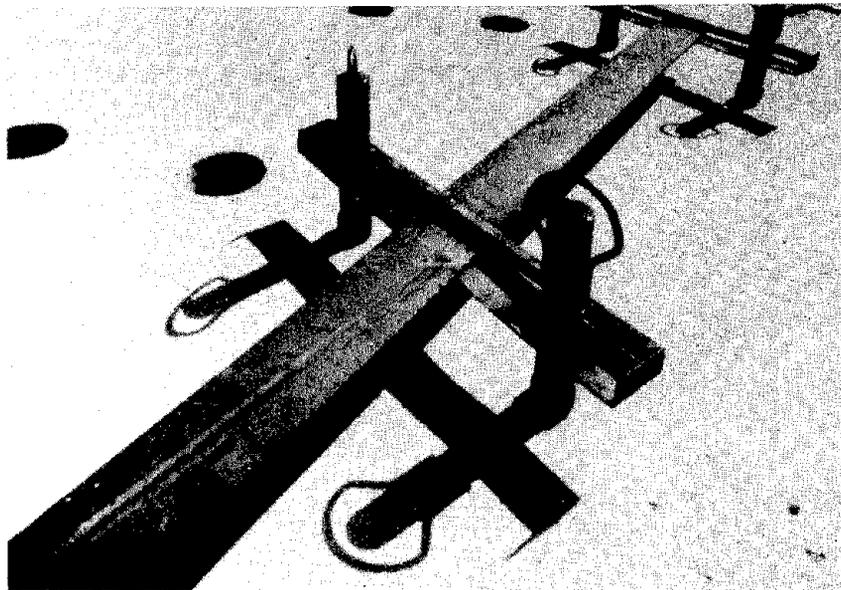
JIGS FOR HOLDING INSERTS IN POSITION
